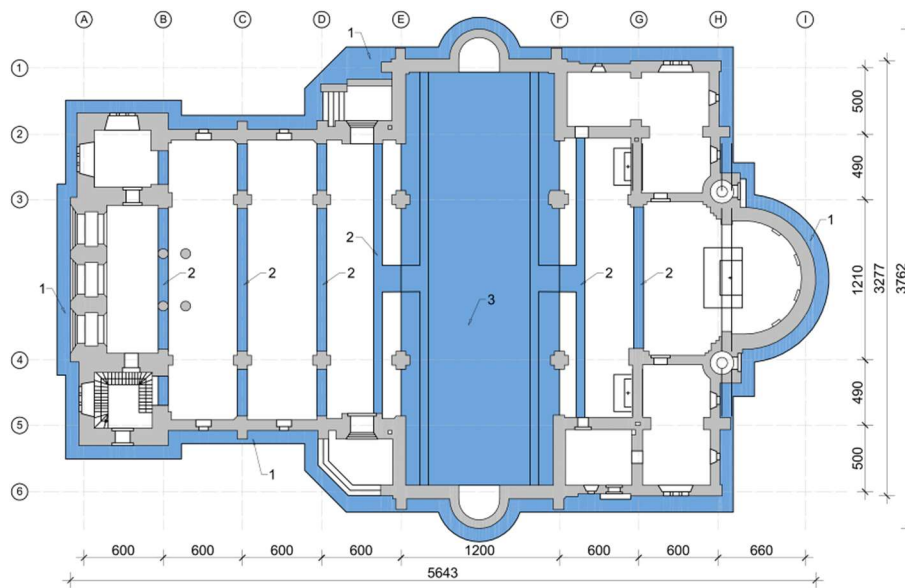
Strengthening of the church horizontal foundation in the years 1986-1987:
